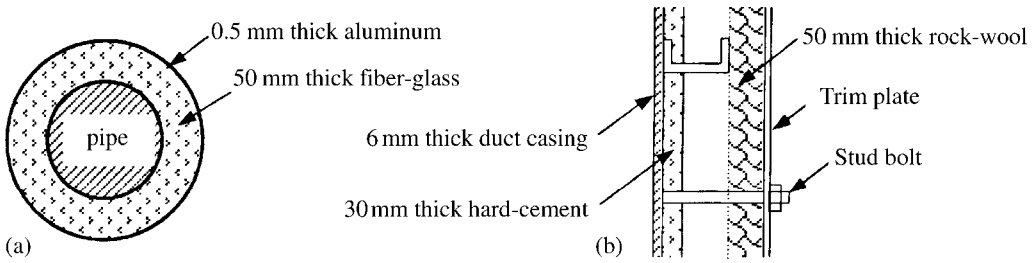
Examples of typical sound insulation laggings: (a) pipe lagging, (b) duct lagging.
